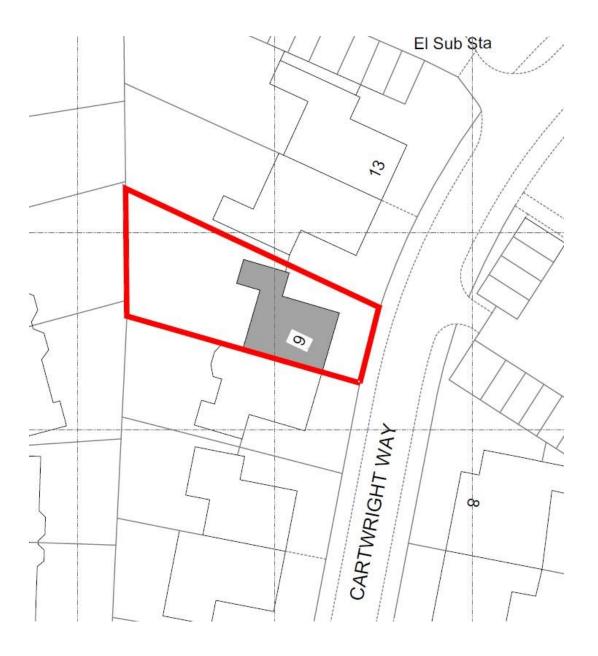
SITE LOCATION PLAN FOR REFERENCE ONLY
